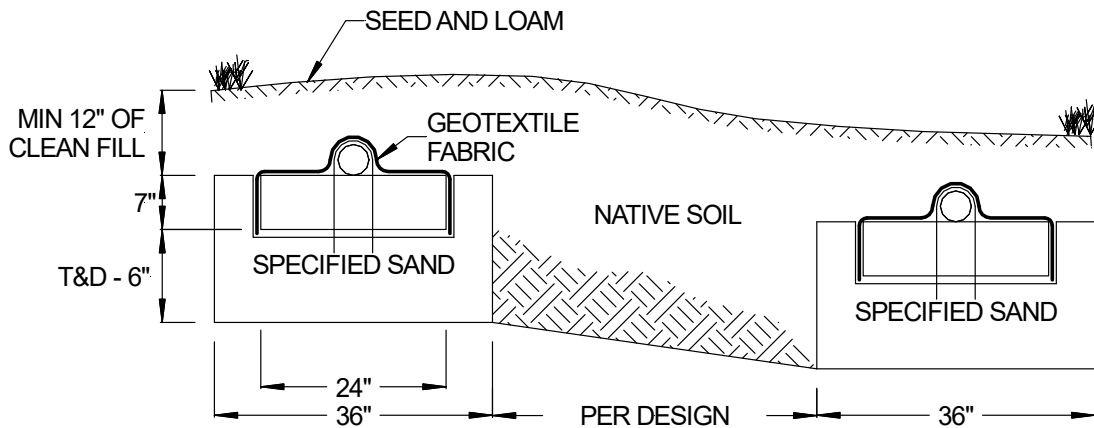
SECTION VIEW – A42 MODULES – TRENCH SYSTEM – SLOPING SITE
